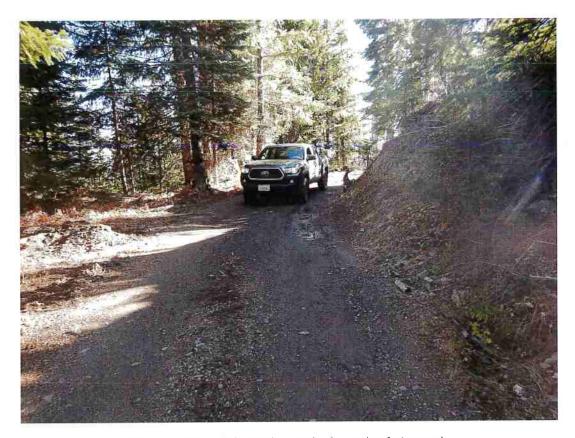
RP 6. Vehicle traveling north, photo taken facing south.
